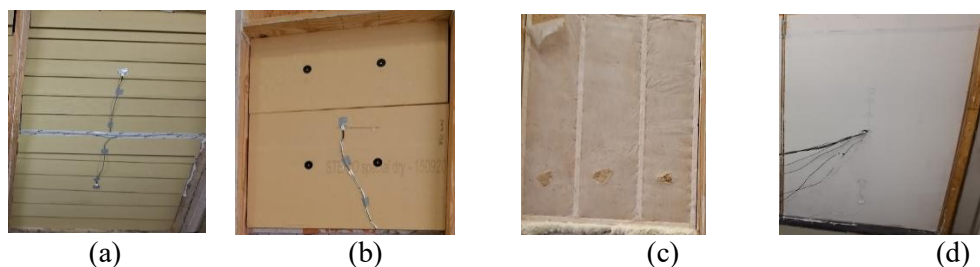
Constructed wall system: (a) Fiber cement cladding, (b) WFI board, (c) Loose-fill WFI, and (d) painted drywall.
